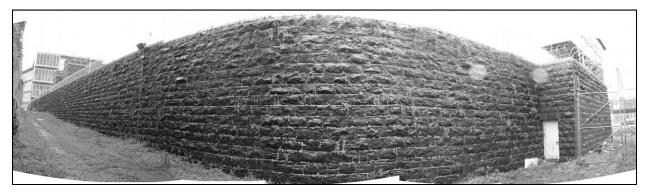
Fish-eye panorama of East Wall from northern end (note the door into the guard tower block)
